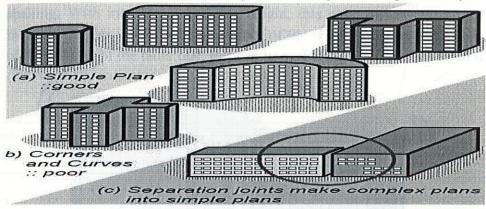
Effect of Horizontal Layout of the Building on Earthquake Damage
